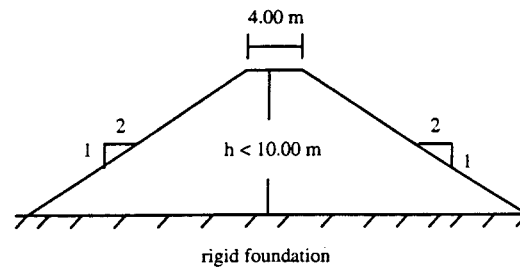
Typical cross section of a small dam in Northeast Brazil..
